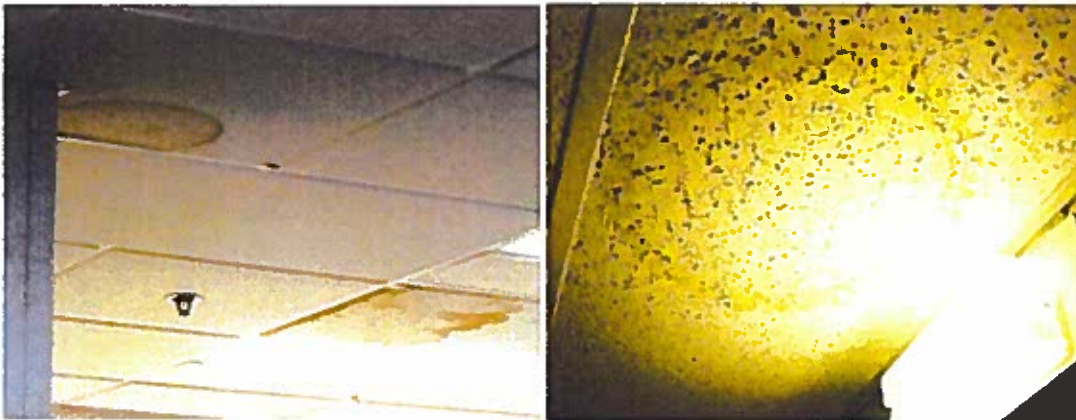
A Water spot above this ceiling tile has not yet penetrated down.
